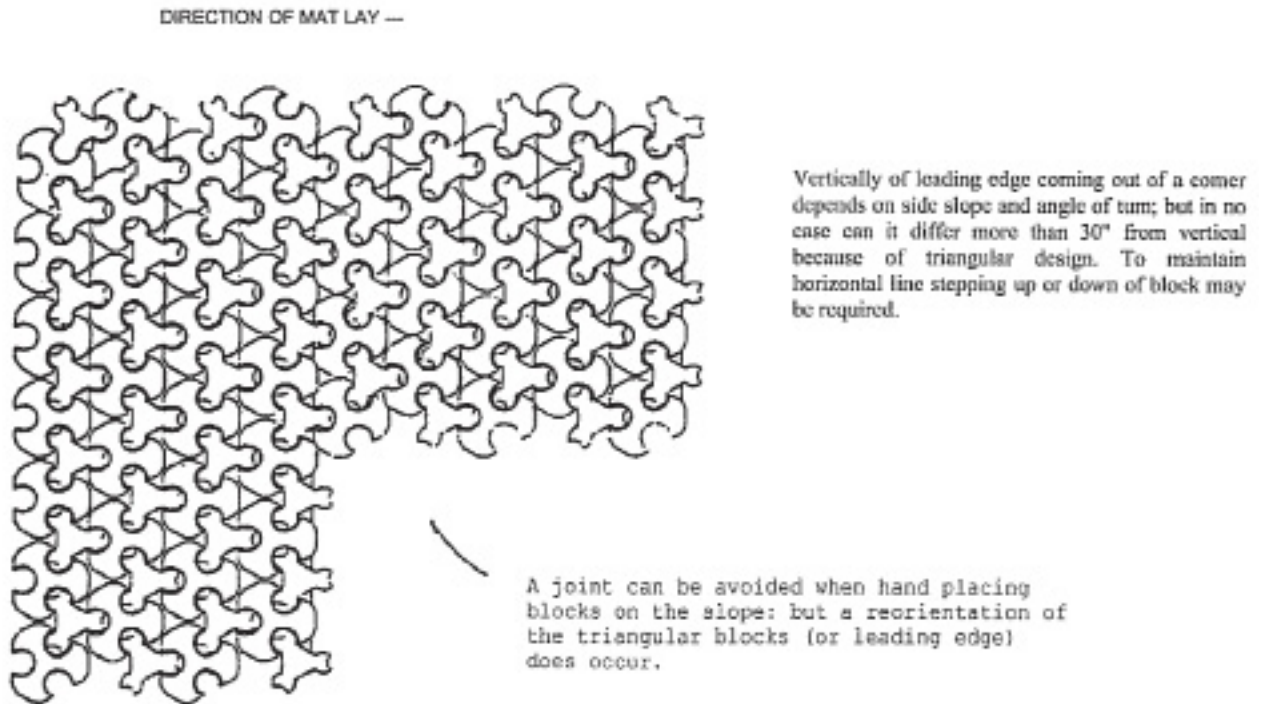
Diagram c-c-, Plan View of 90° Corner - Handplaed mat installation
